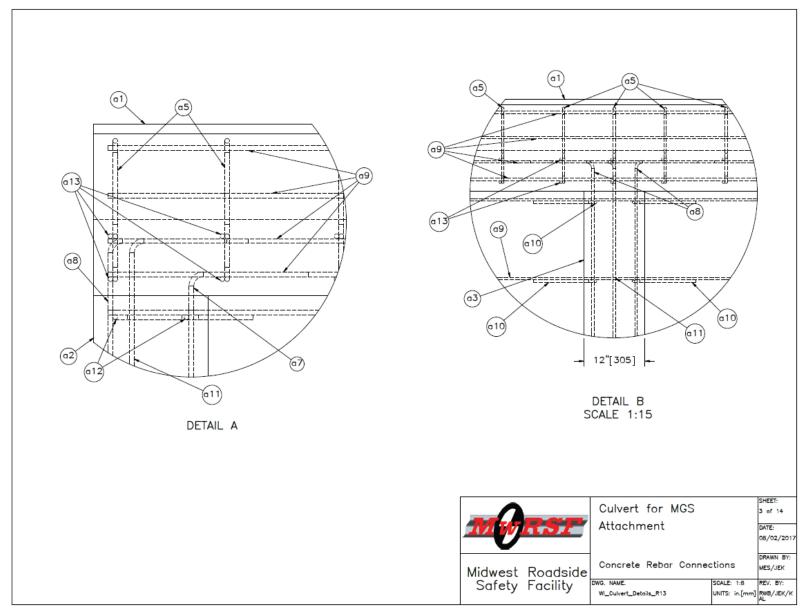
Concrete Rebar Connections, Test Nos. CMGS-1 and CMGS-2
